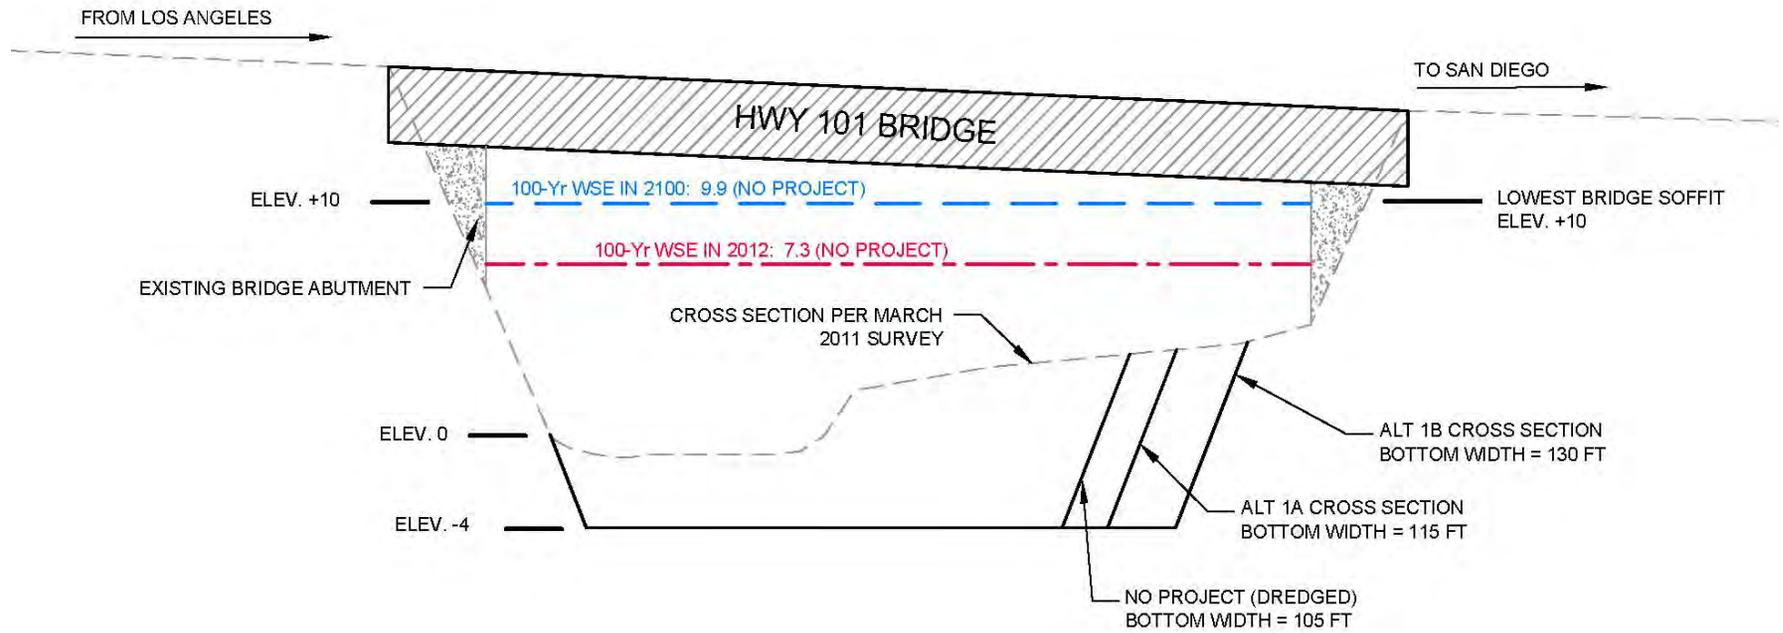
Existing Highway 101 Bridge Channel Cross-Section
